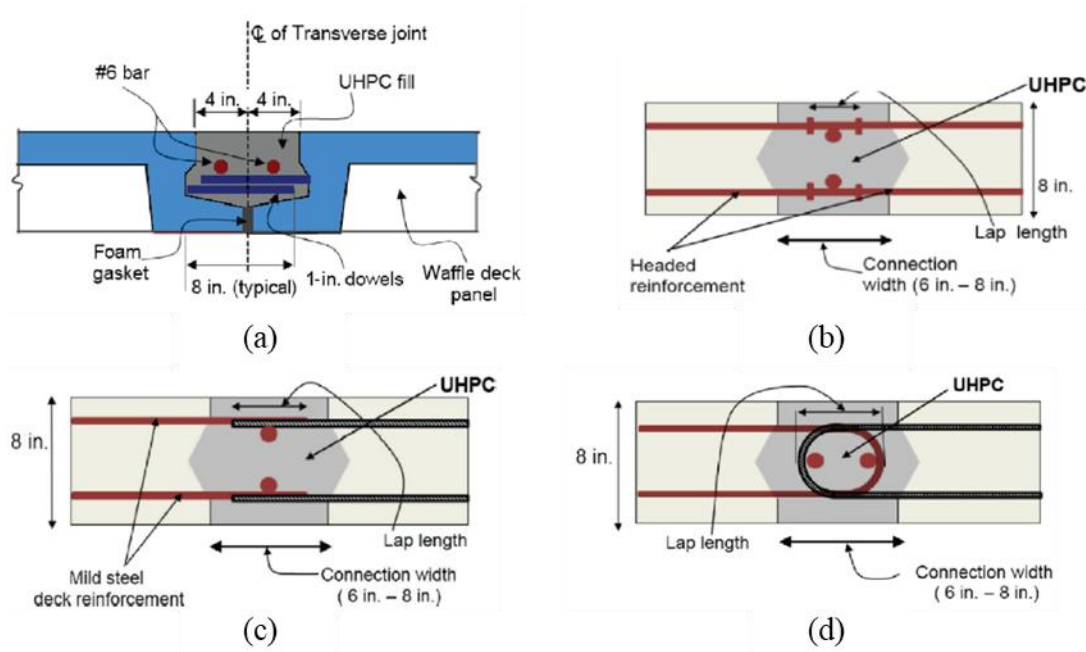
Common panel-to-panel UHPC connection details: (a) waffle deck panel-to-panel connection detail, (b) panel-to-panel headed connection detail, (c) panel-to-panel straight connection detail, and (d) panel-to-panel hairpin reinforcement [Aaleti and Sritharan, 2014]^[24].
